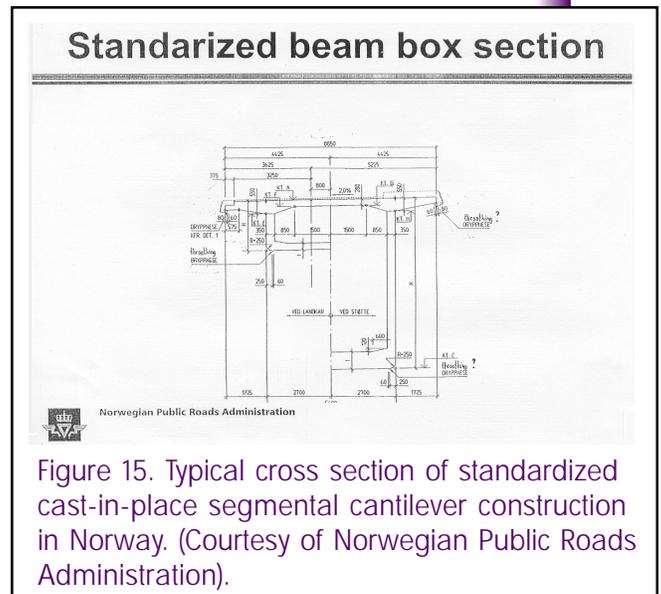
Typical cross section of standardized cast-in-place segmental cantilever construction in Norway. (Courtesy of Norwegian Public Roads Administration).
